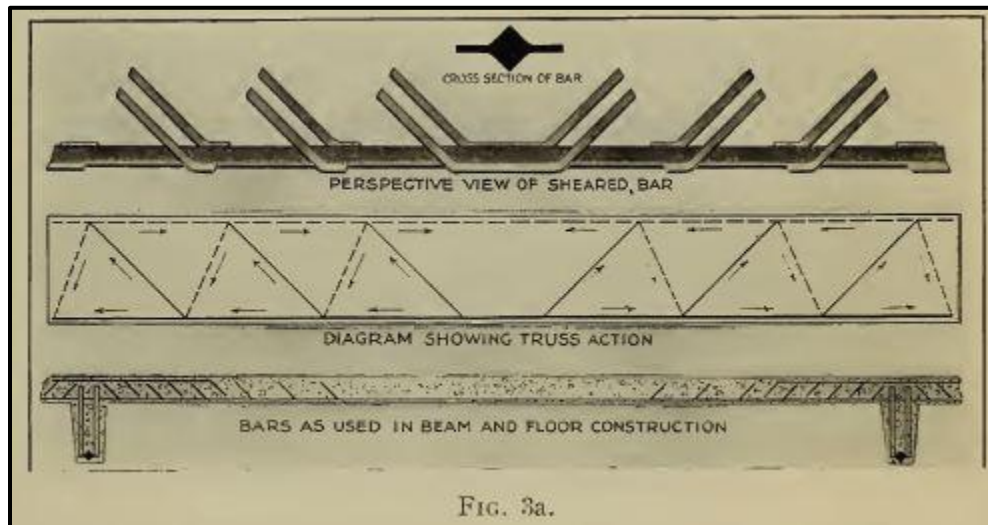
Formation of a Pratt Truss with the Kahn Bar.
